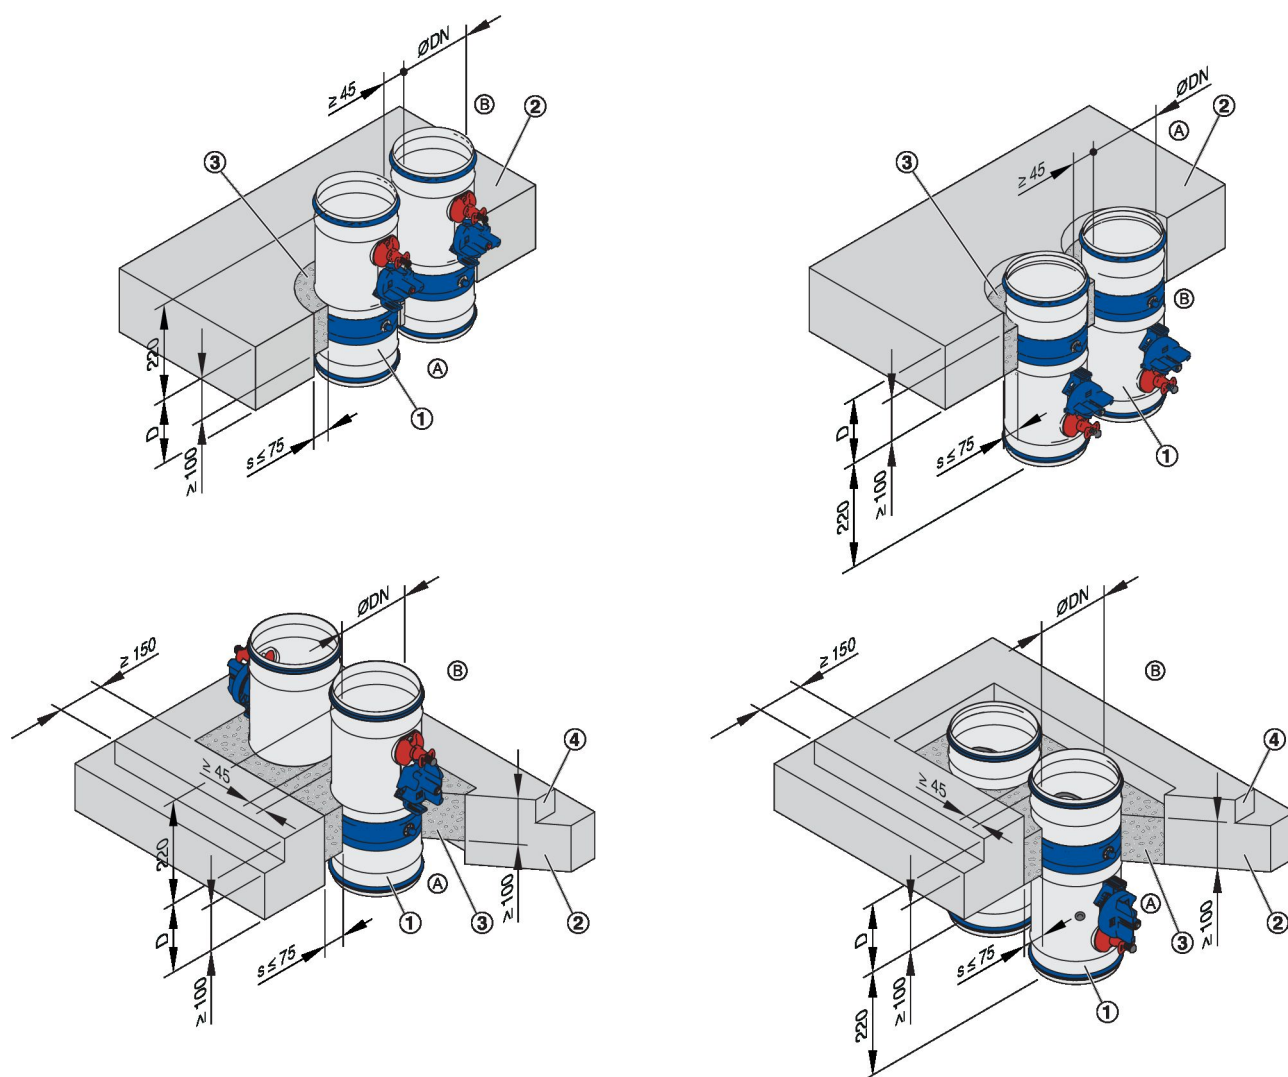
Mortar-based installation into solid ceiling slab, suspended or upright, two fire dampers side by side
